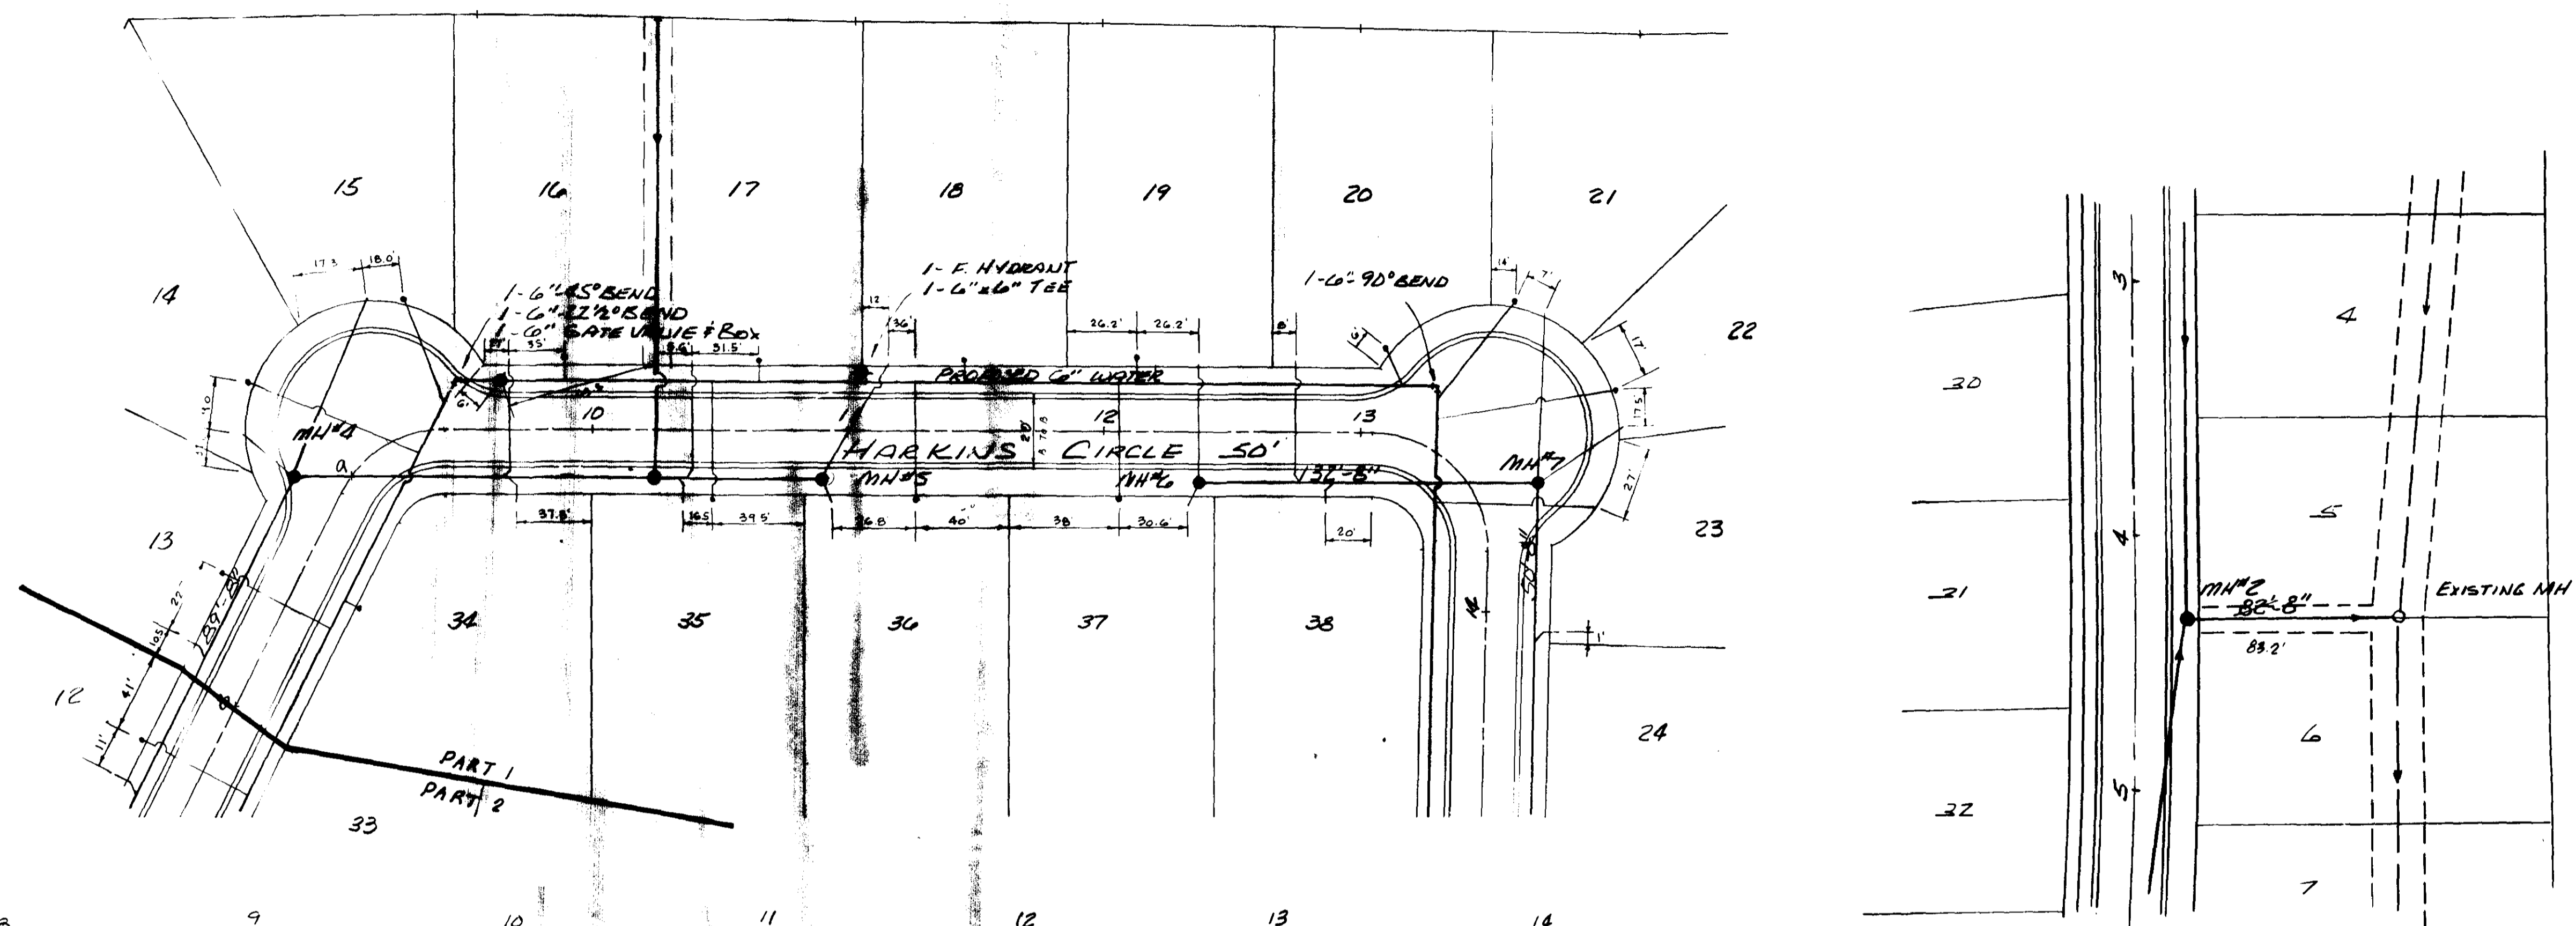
SINGLE PLAN AND PROFILE FULL DOT
